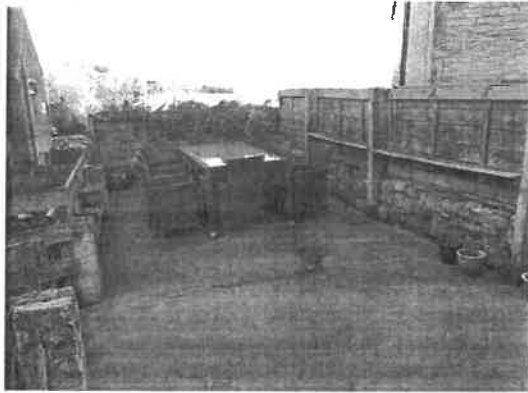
Overview of the roof terrace with bridge-house link to the left-hand side.
